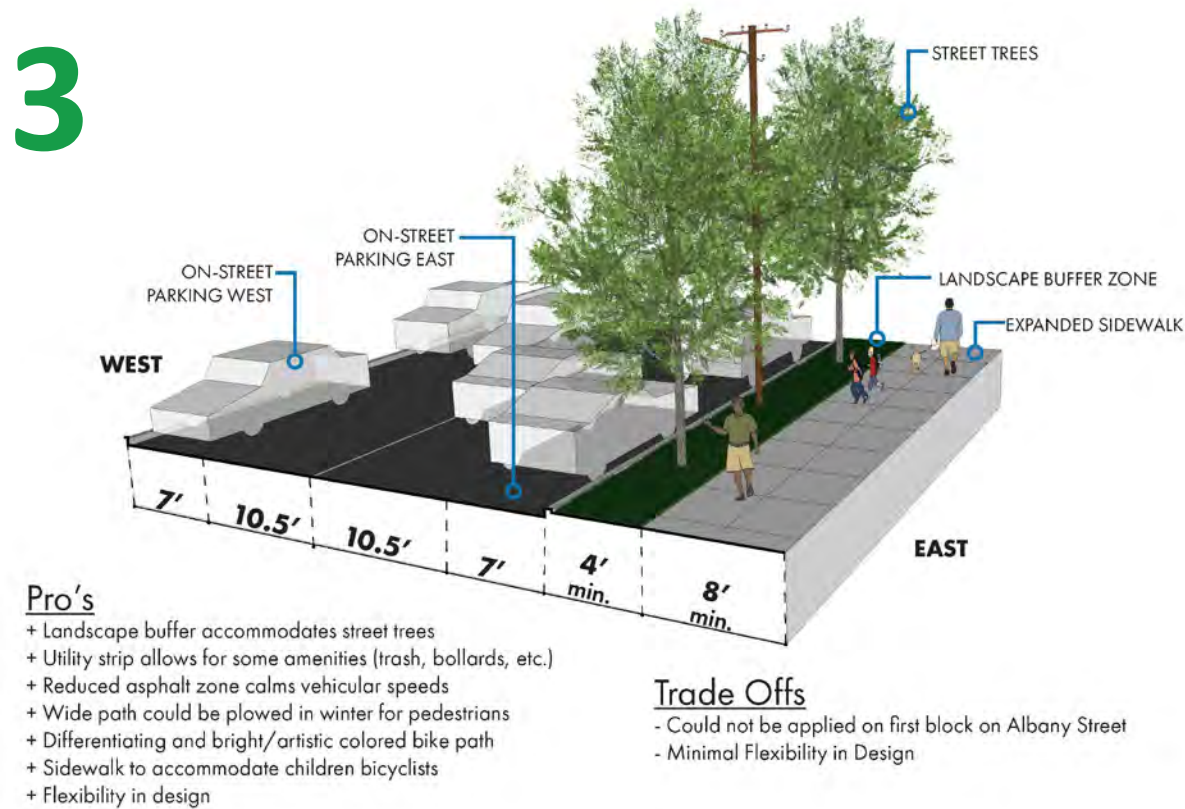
Craig Street Option 3: On Street Parking East and West with Improved Sidewalks
